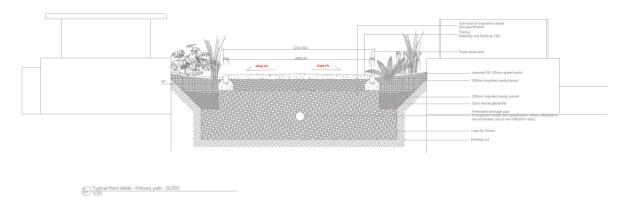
Section drawing of PAV01 – Primary Path, as provided by Gustafson, Porter + Bowman.
